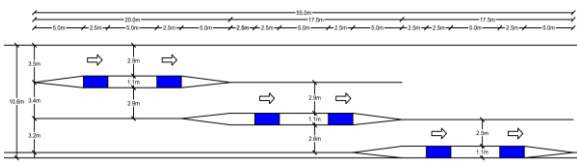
Layout Plan of the Kuningan 2 Toll Gate
